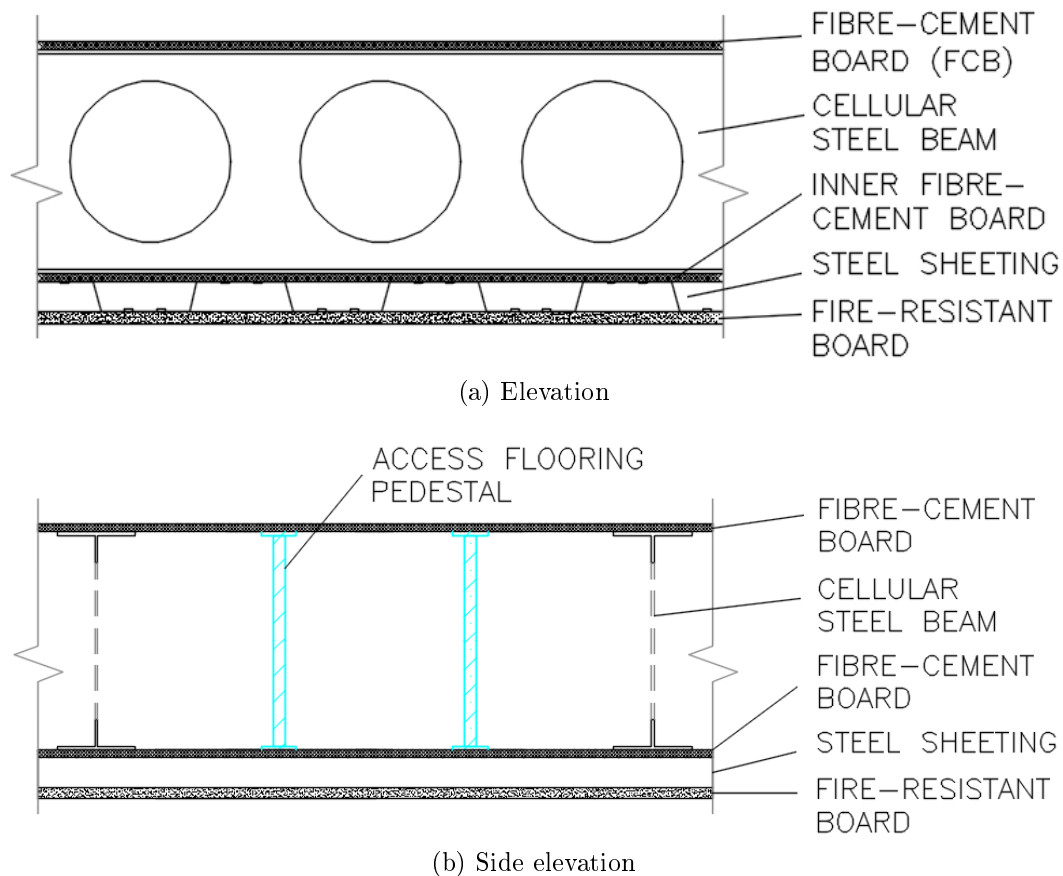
Schematic cross-sections of cellular beam structure (CBS) floor system (Marx, 2018). Note: drawing not to scale.
